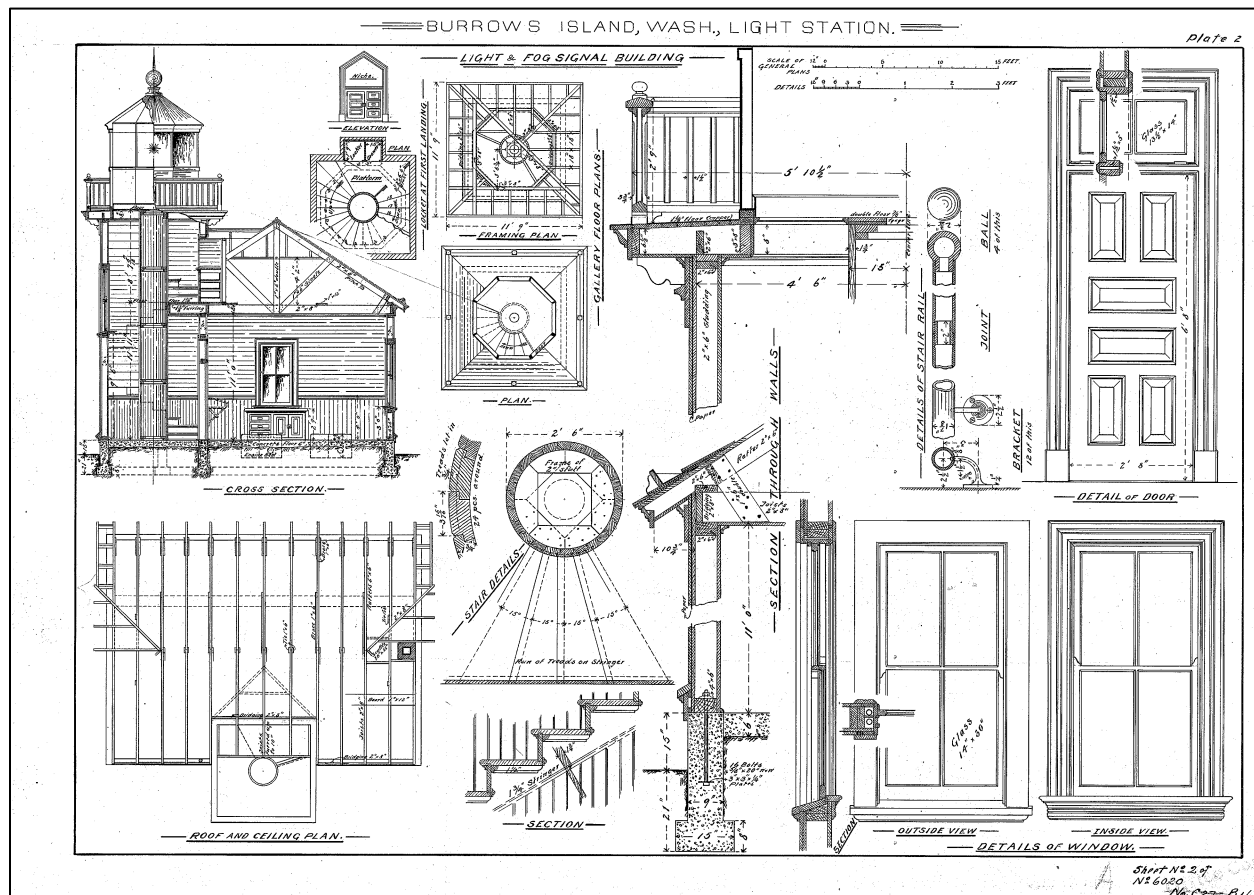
of 42: Architectural drawings by Carl W. Leick of the Light Tower and Fog Signal Building including a cross-section as well as door, window, and stair details, 1905.⁷²
